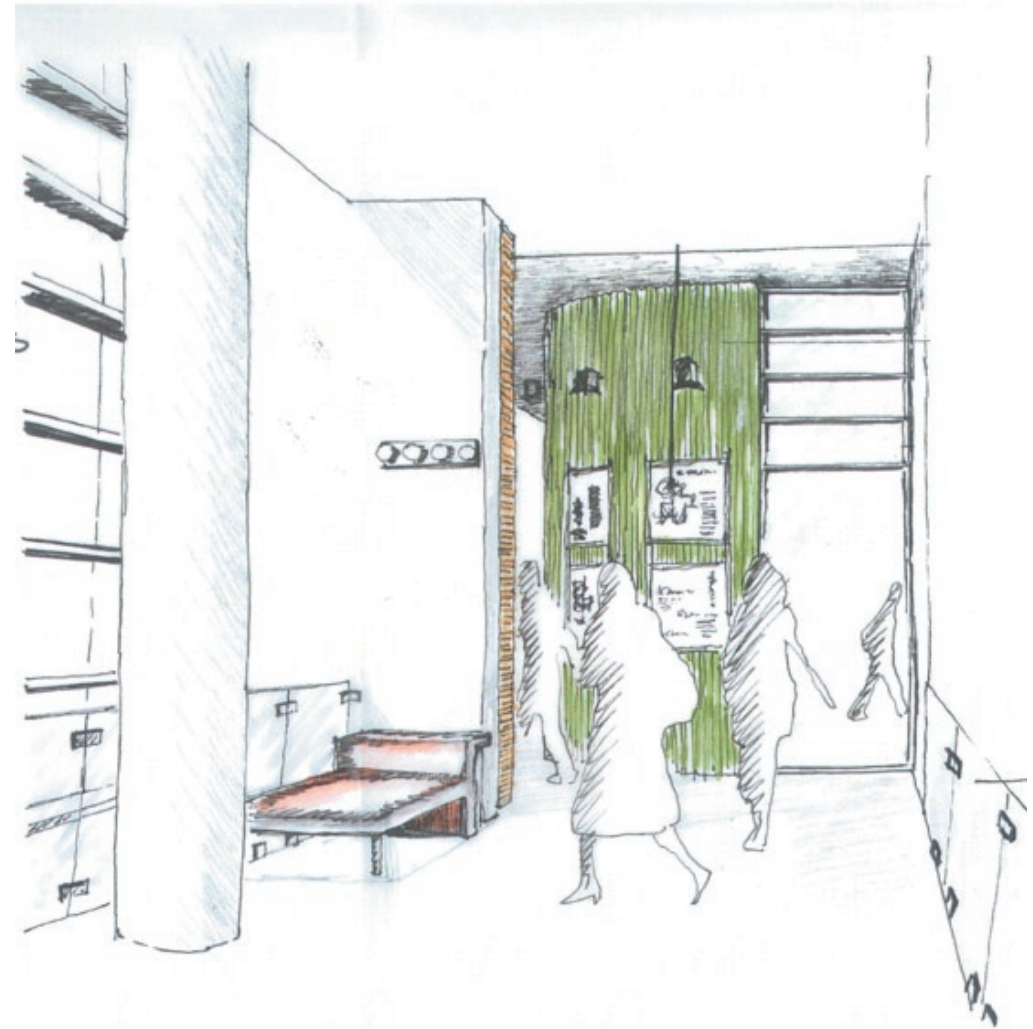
Looking toward the classroom on the third floor - curved walls express movement around corners.
